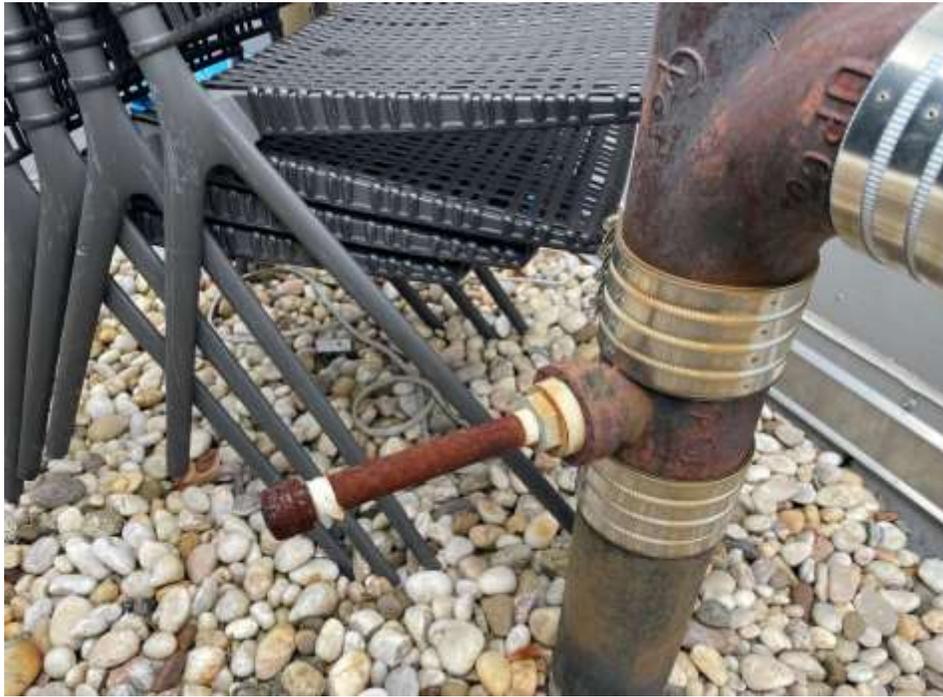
V6 riser and sample port in good condition, facing northwest. 8 April 2021.
